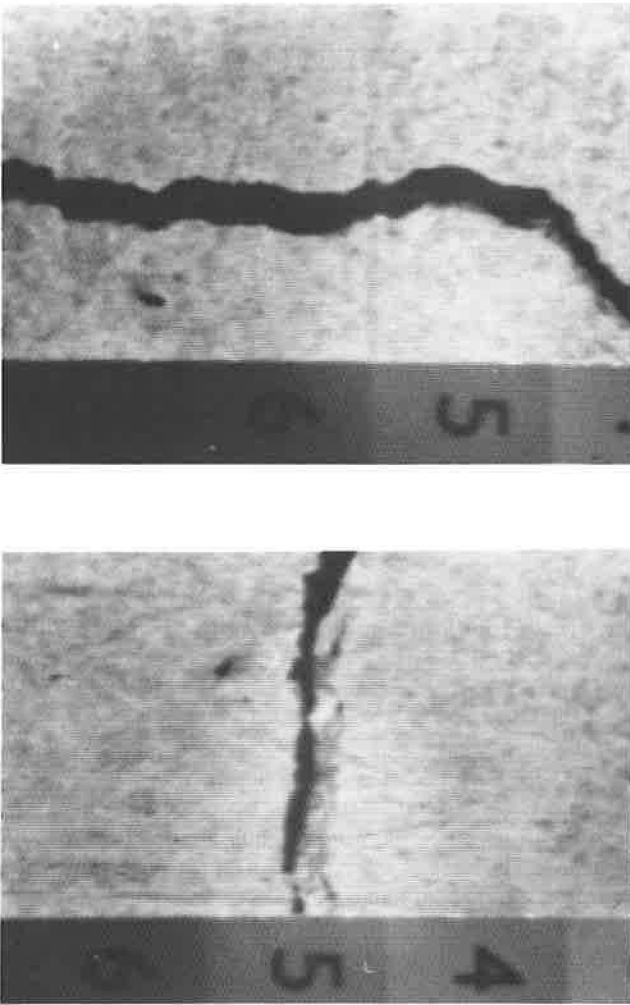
Digital images of the pavement sample shown in Figure 7 except that the crack width is 1.5 mm (0.06 in.) (top) illumination crosswise to the crack and (bottom) illumination along the crack.
